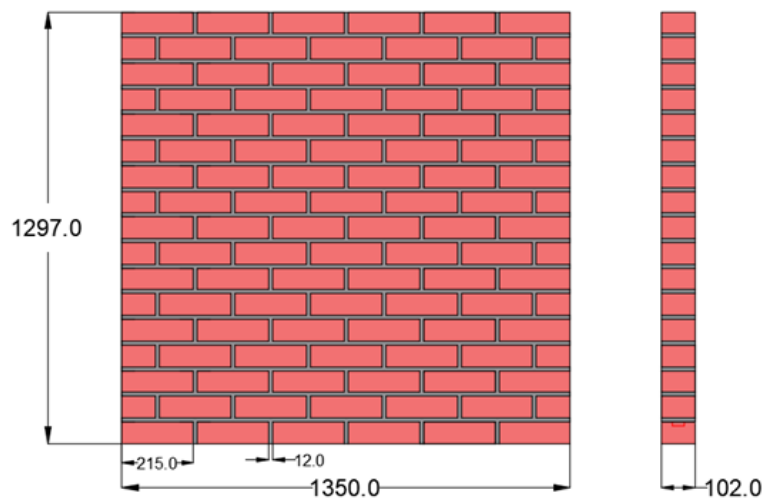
Dimensions (mm) of the walls type B subjected the in plane lateral cyclic loads.
